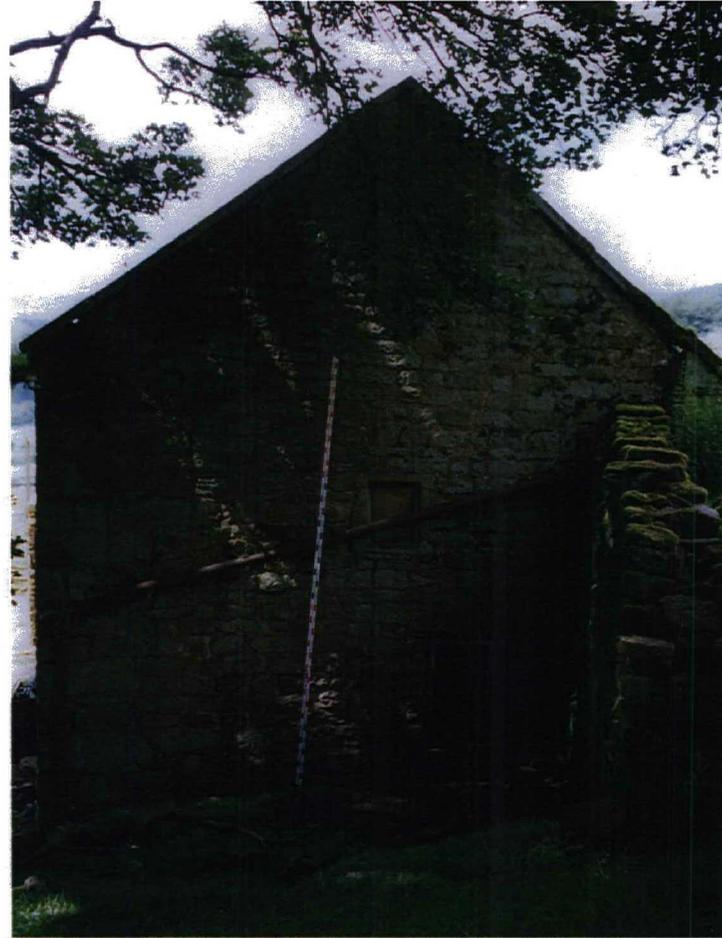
The east elevation, showing blocked windows and doors and a retaining wall, presumably to support the earth back-filled against the north wall of the house.
